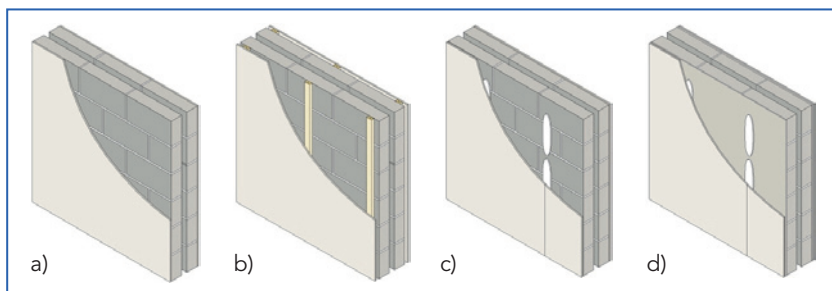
Typical blockwork cavity separating walls found in the UK :
